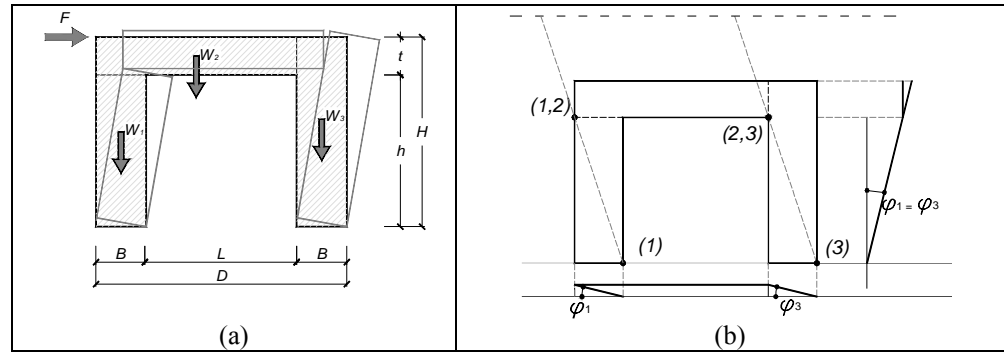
III mechanism – a) geometry and loads; b) kinematic chain.
